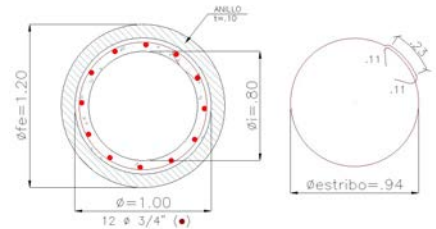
Typical hollow reinforced pile (transverse section). Common foundation type. Seven story project. Photo courtesy of Alvaro P
